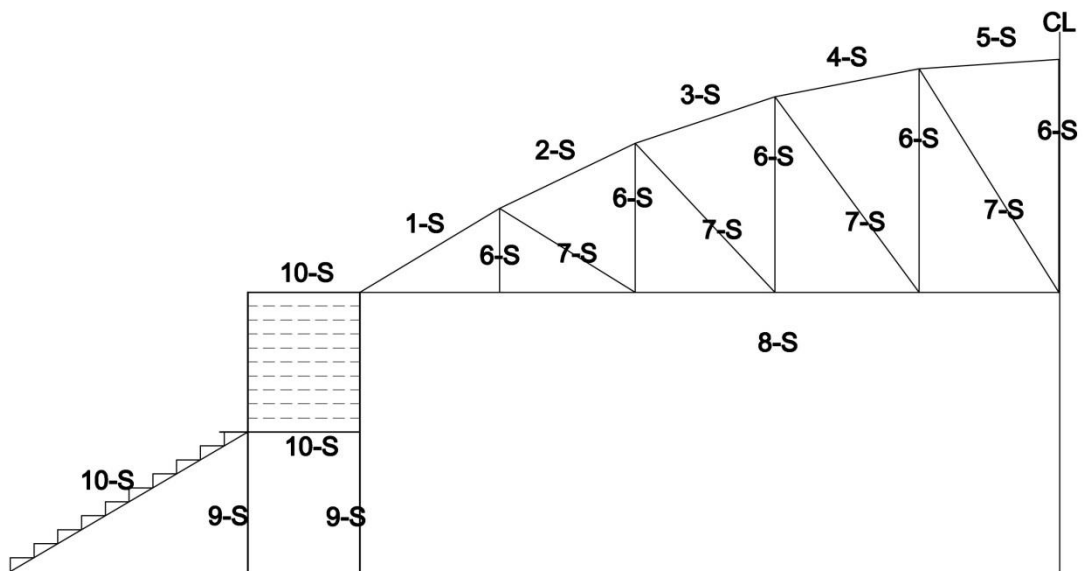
Section ID for elements of single span arch bridge with simple sections (A3)
